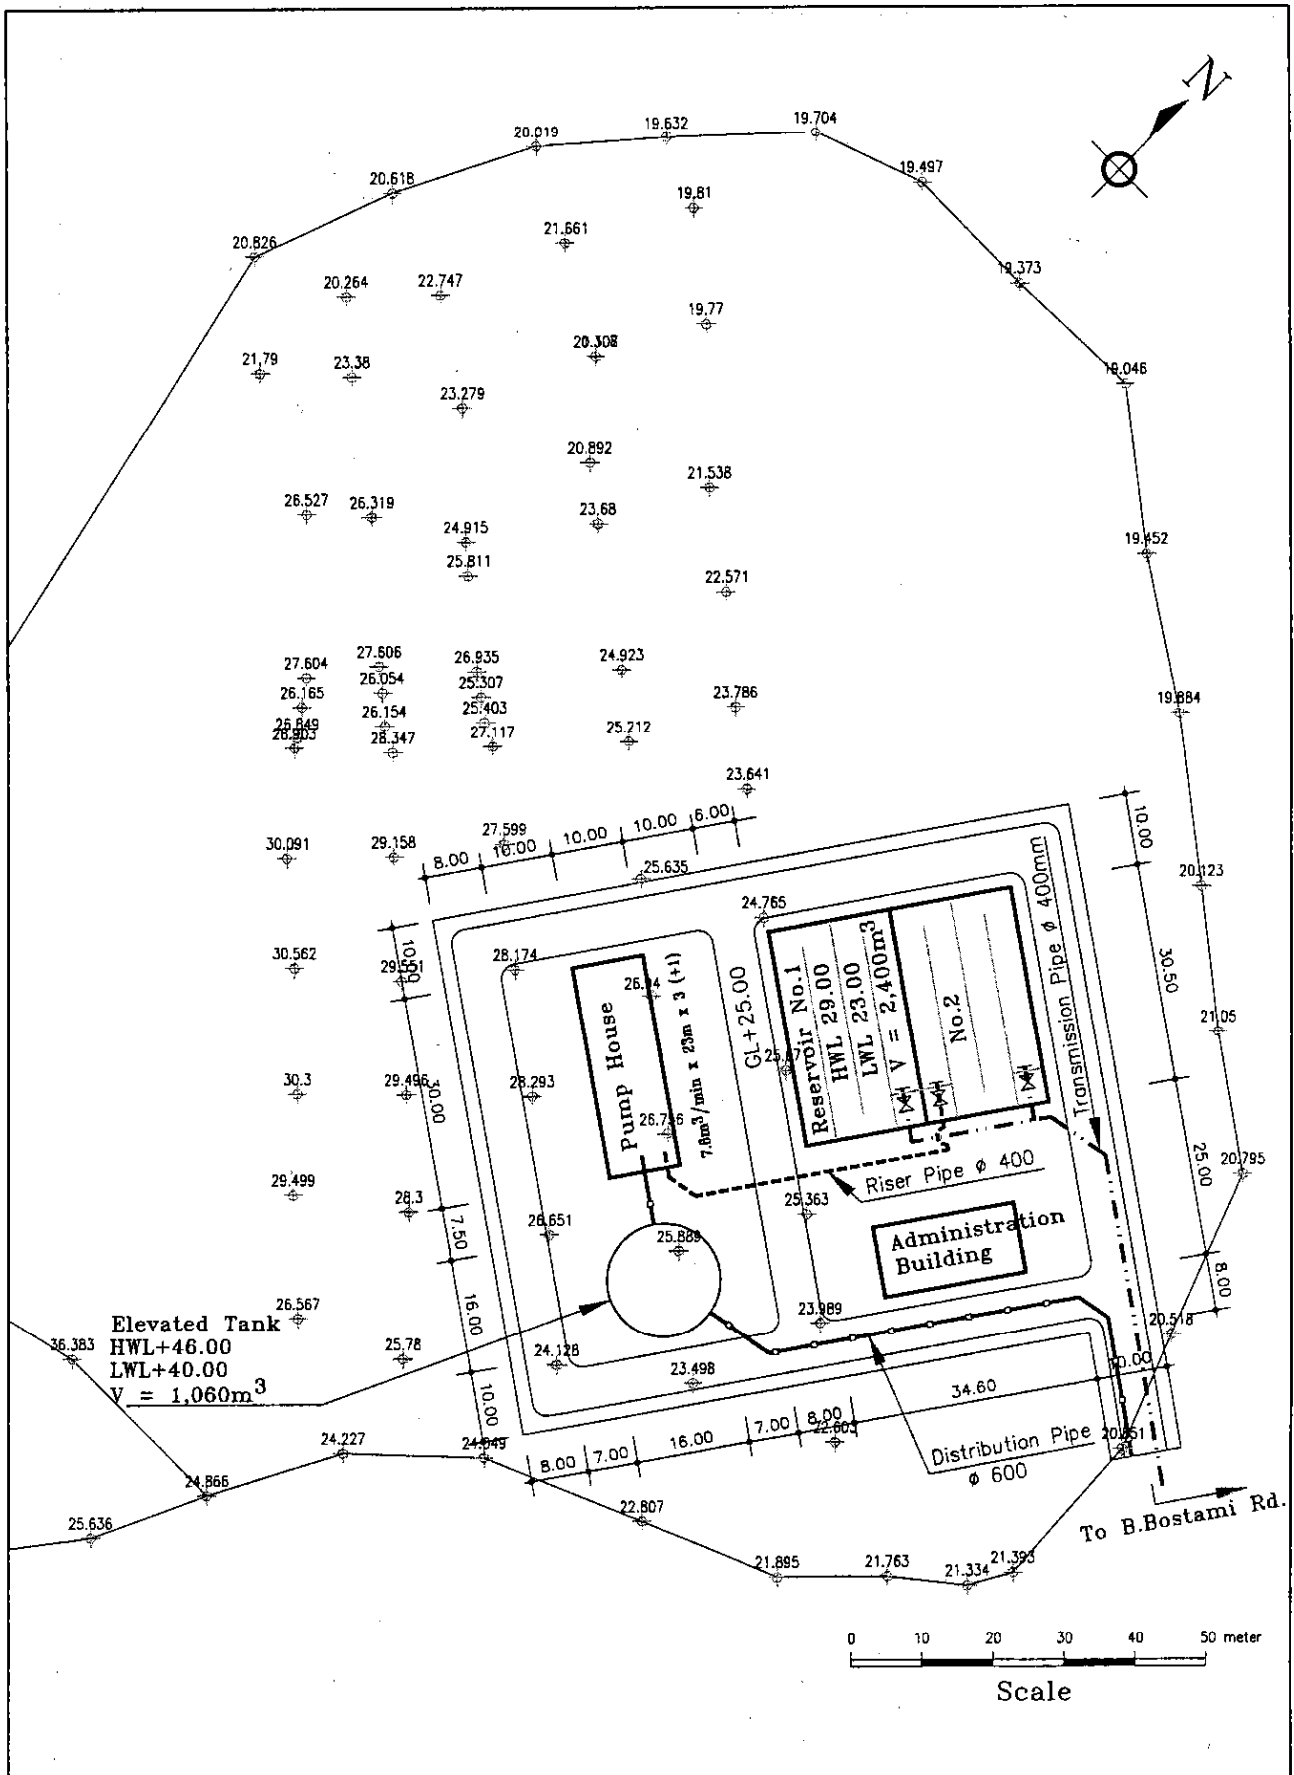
LAYOUT PLAN OF PROPOSED NASIRABAD RESERVOIR (Alternative Case I-b-1)
